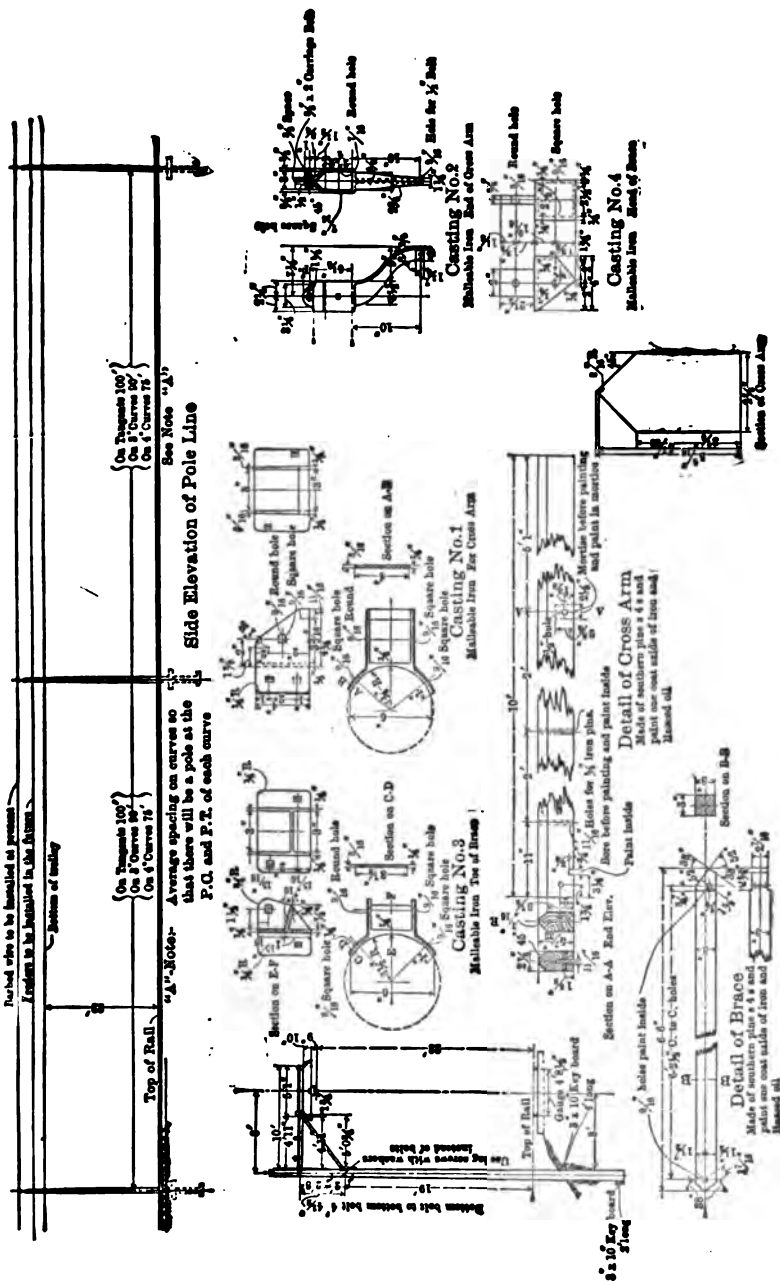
DETAILS OF OVERHEAD WORK, USED ON LANSING, ST. JOHNS & ST. LOUIS RAILWAY.
